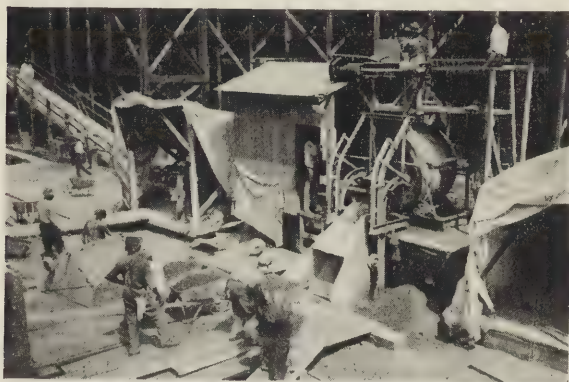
Concrete Mixer charged by elevating skip into which the barrows dump. Note that this means that sand and stone are wheeled on a level.
